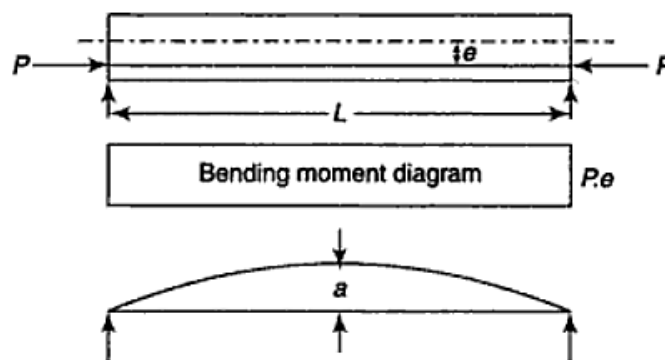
Camber of girder beam under eccentric straight tendon
